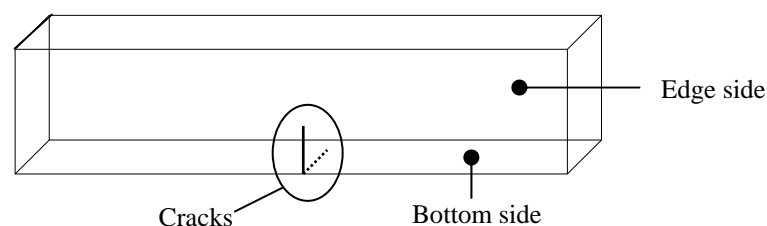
Assumption of crack growth in concrete beam under flexural cyclic load
